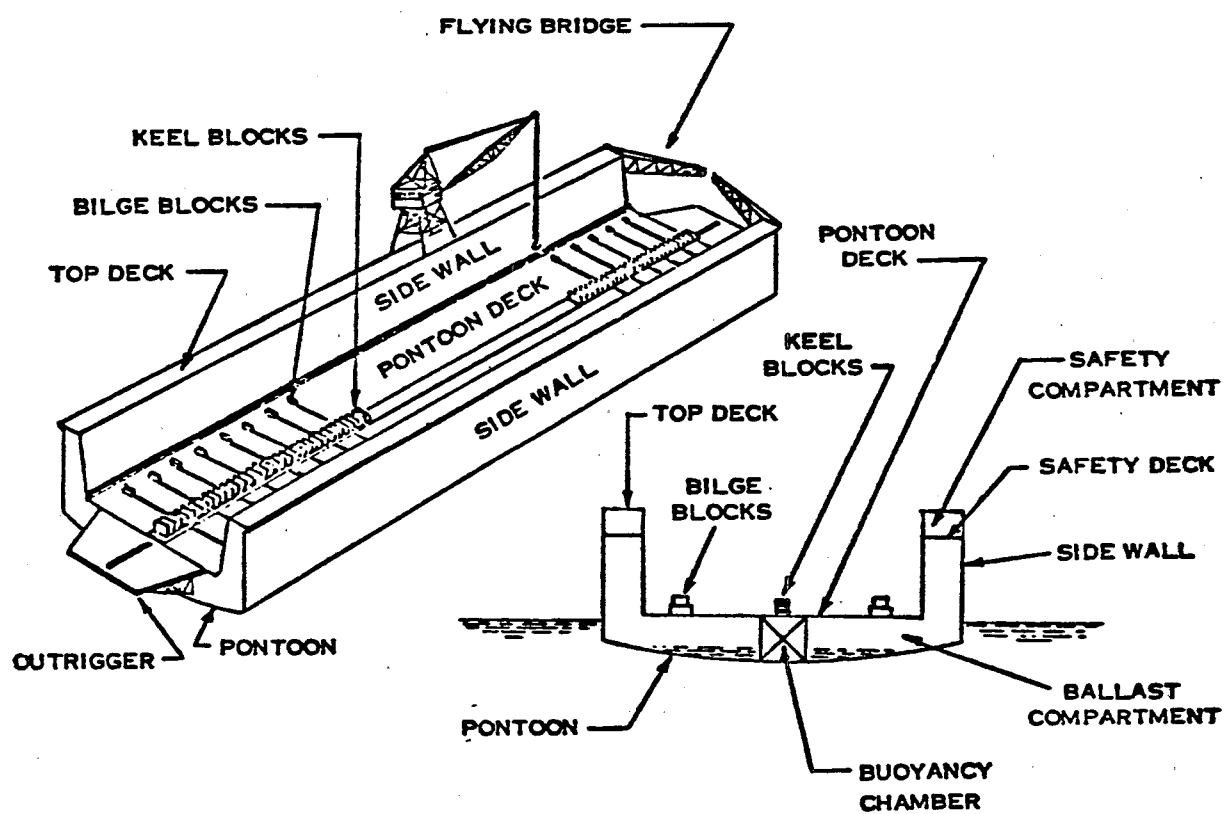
Typical Transverse Section of a Floating Drydock
